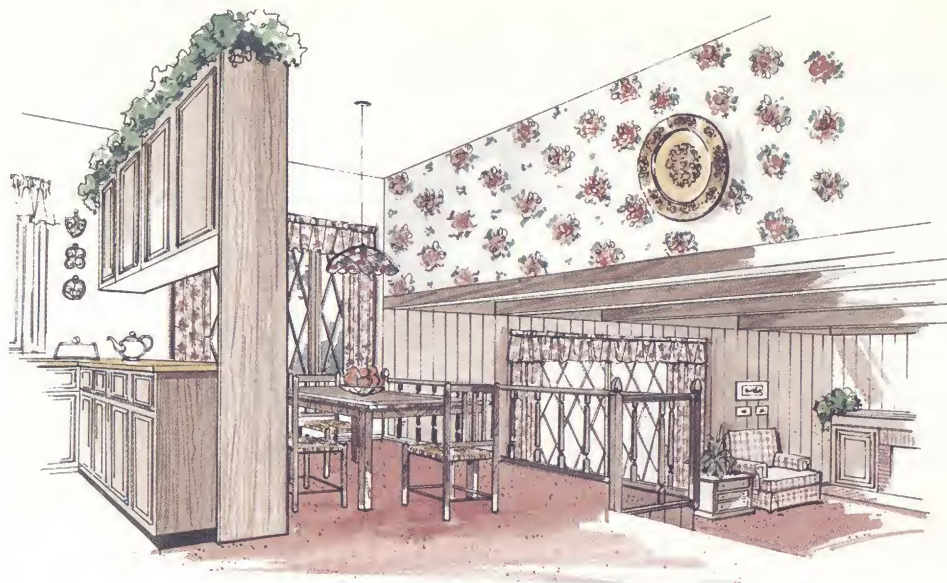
Separation with half walls. (Home Planners, Inc.)
